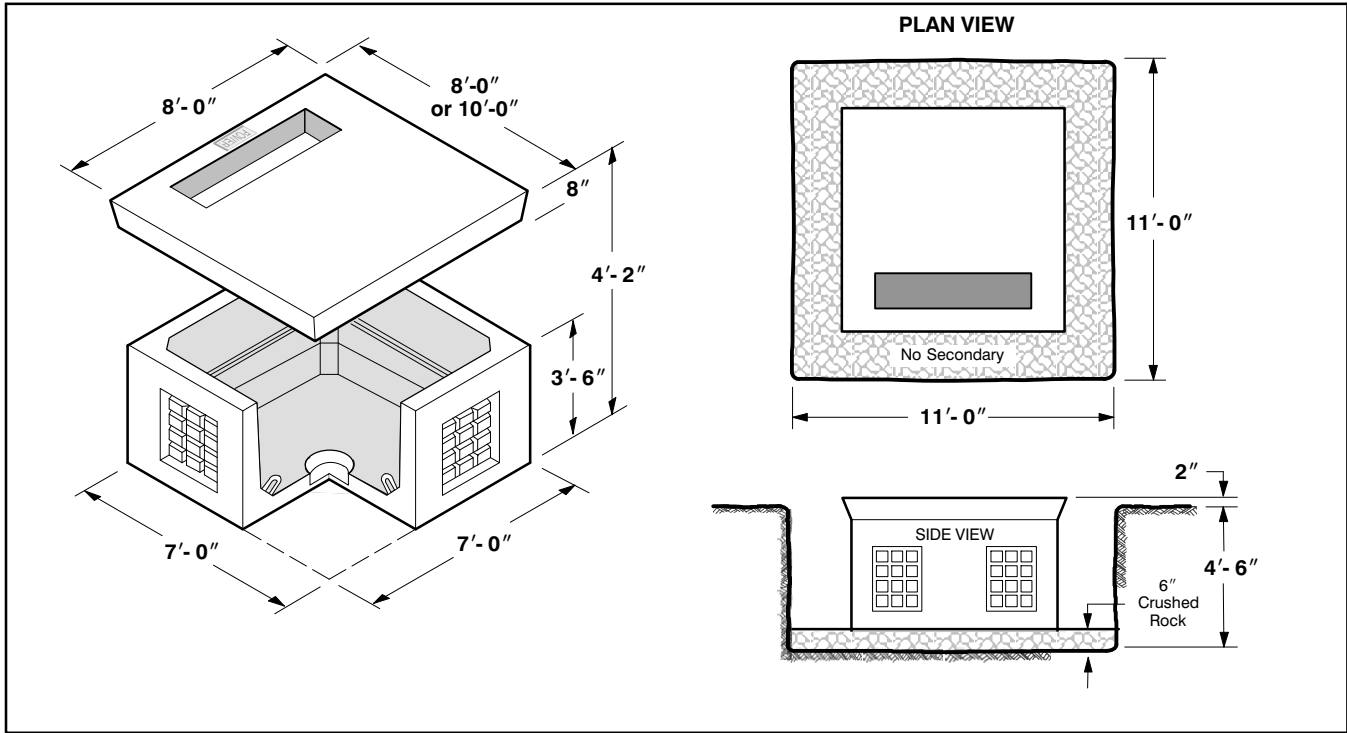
Minimum dimensions and excavation requirements for a three-phase padmount transformer vault, 500 kVA and larger
